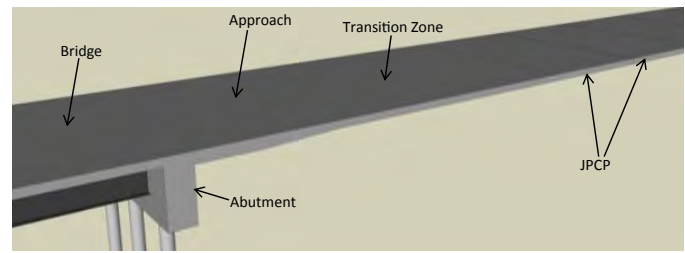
The seamless bridge concept for U.S. practice to be used with jointed plain concrete pavement (JPCP).
